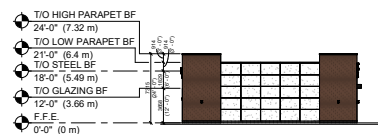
Commercial Building F East Elevation (typical concept design for commercial buildings on proposed site)
